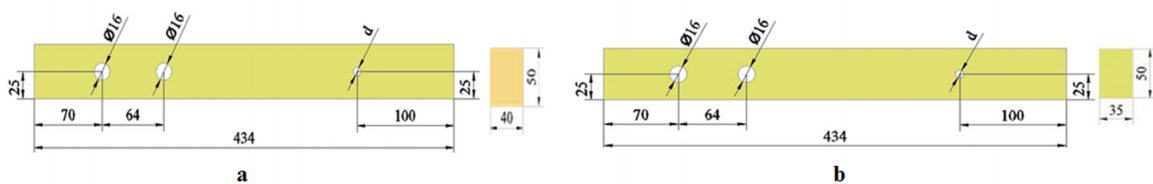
Specimen size: (a) the central element; (b) lateral element.
